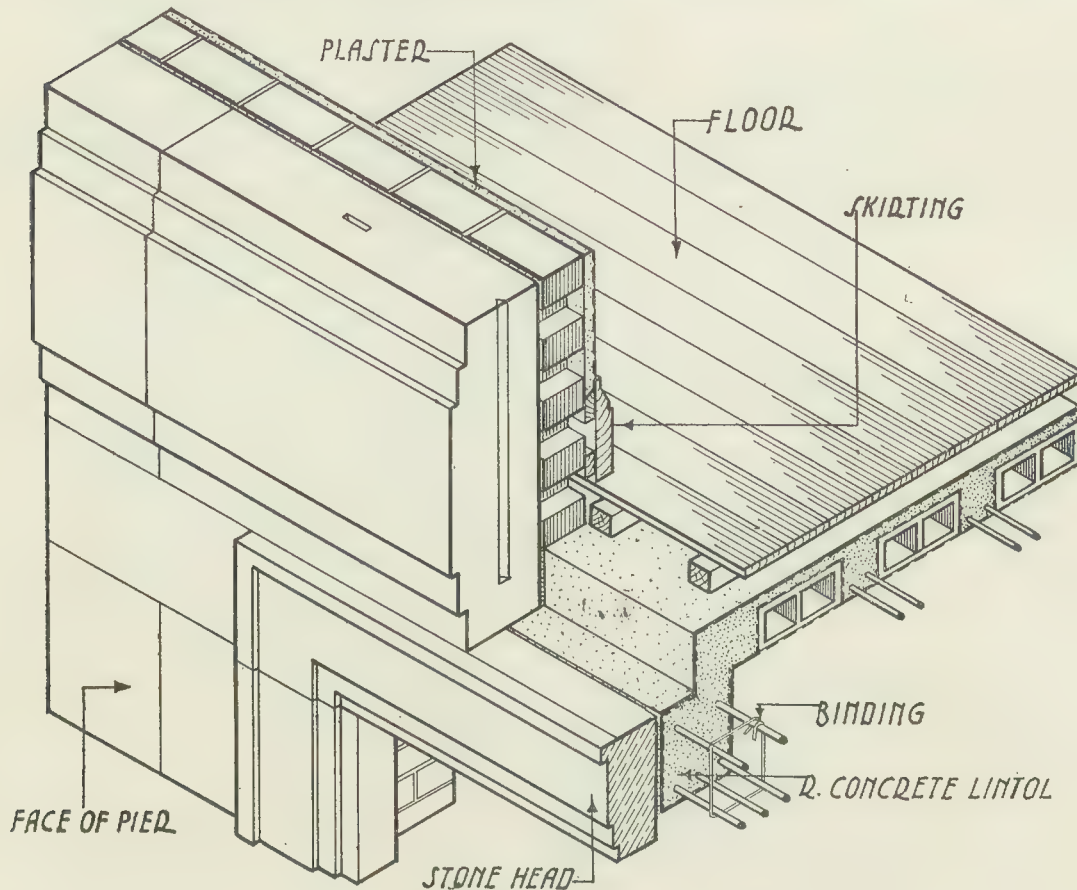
CONSTRUCTION OF STONE HEAD OVER WINDOW OPENING
